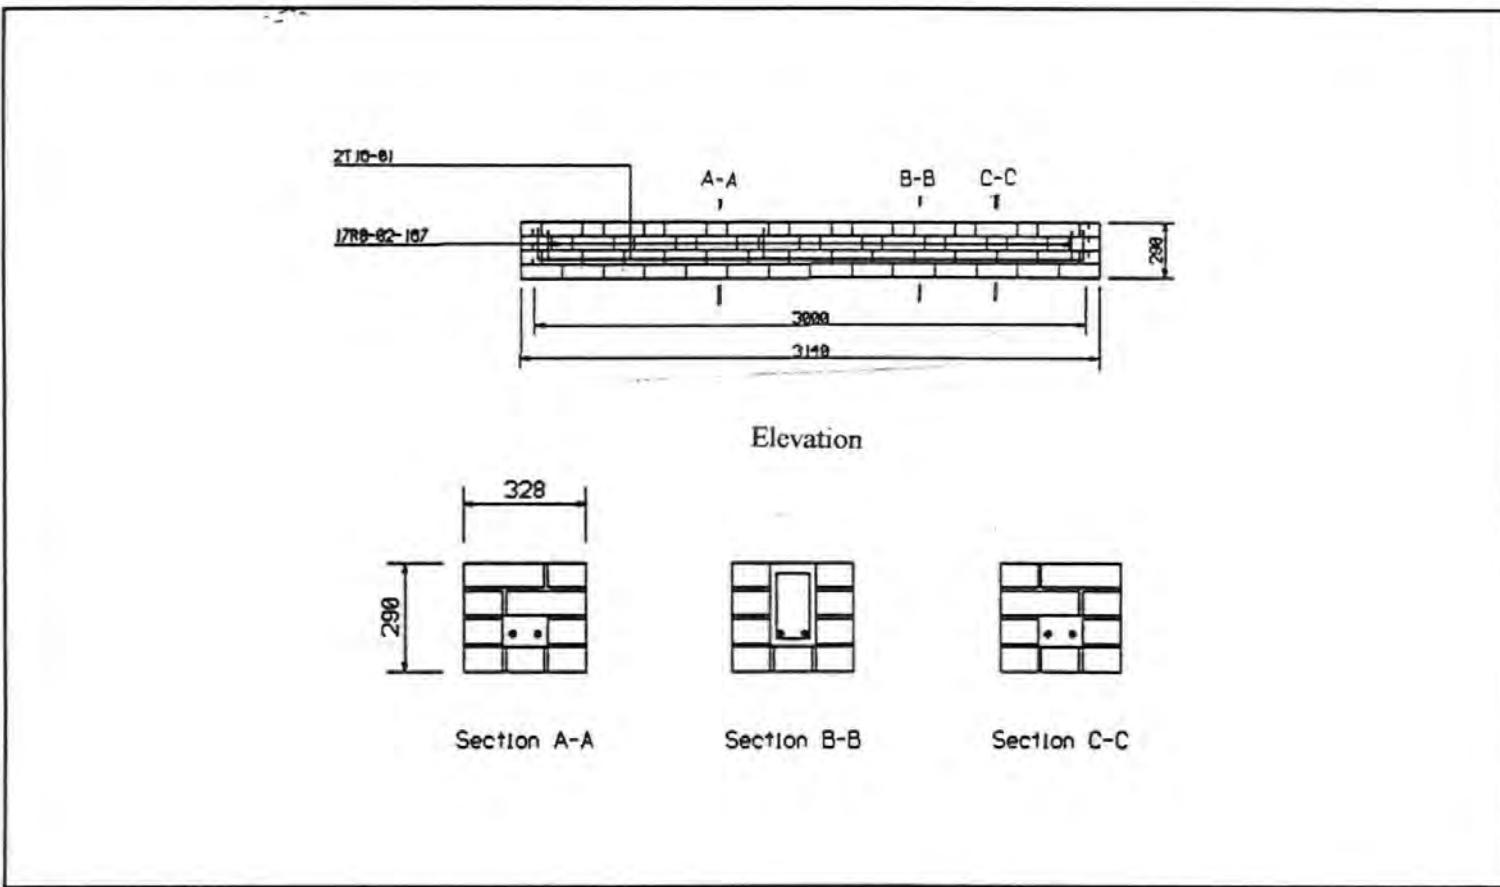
UOP Quetta Style Test Beam, 3m span
